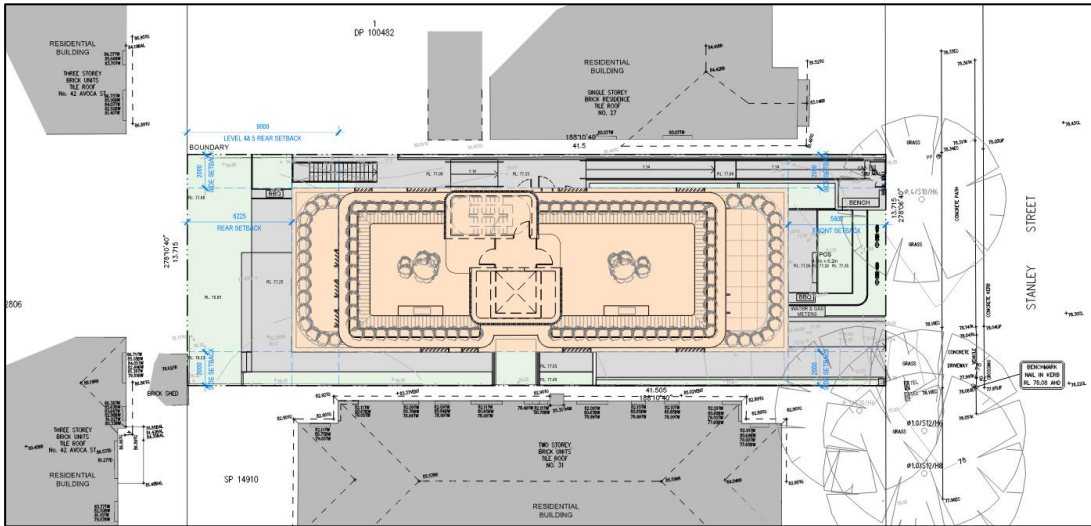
Site Plan for 29 Stanley Street (Source: Applicant)
